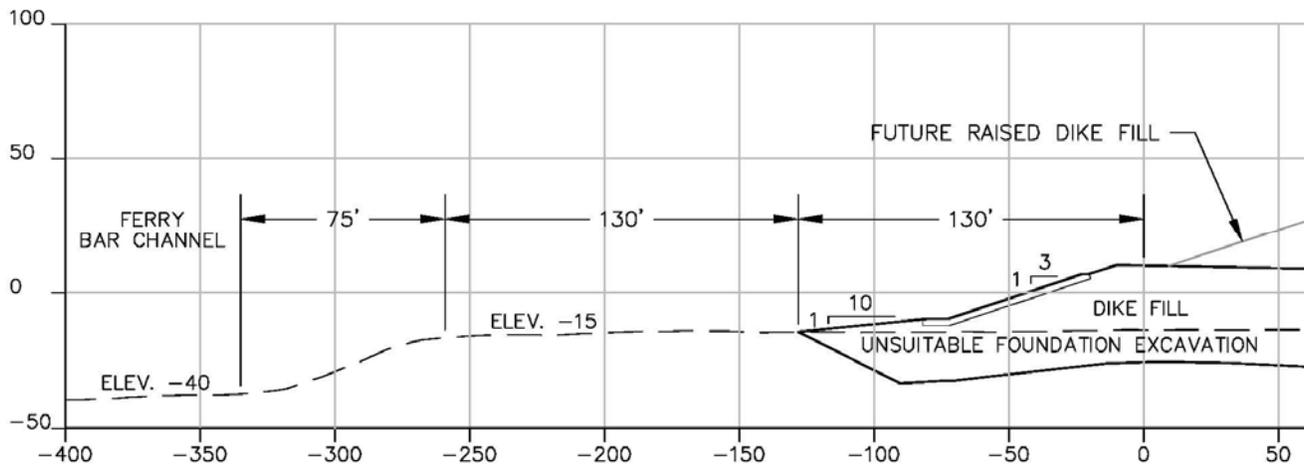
Cross Section of Undercut, Channel with side slopes of Fill and Dike
